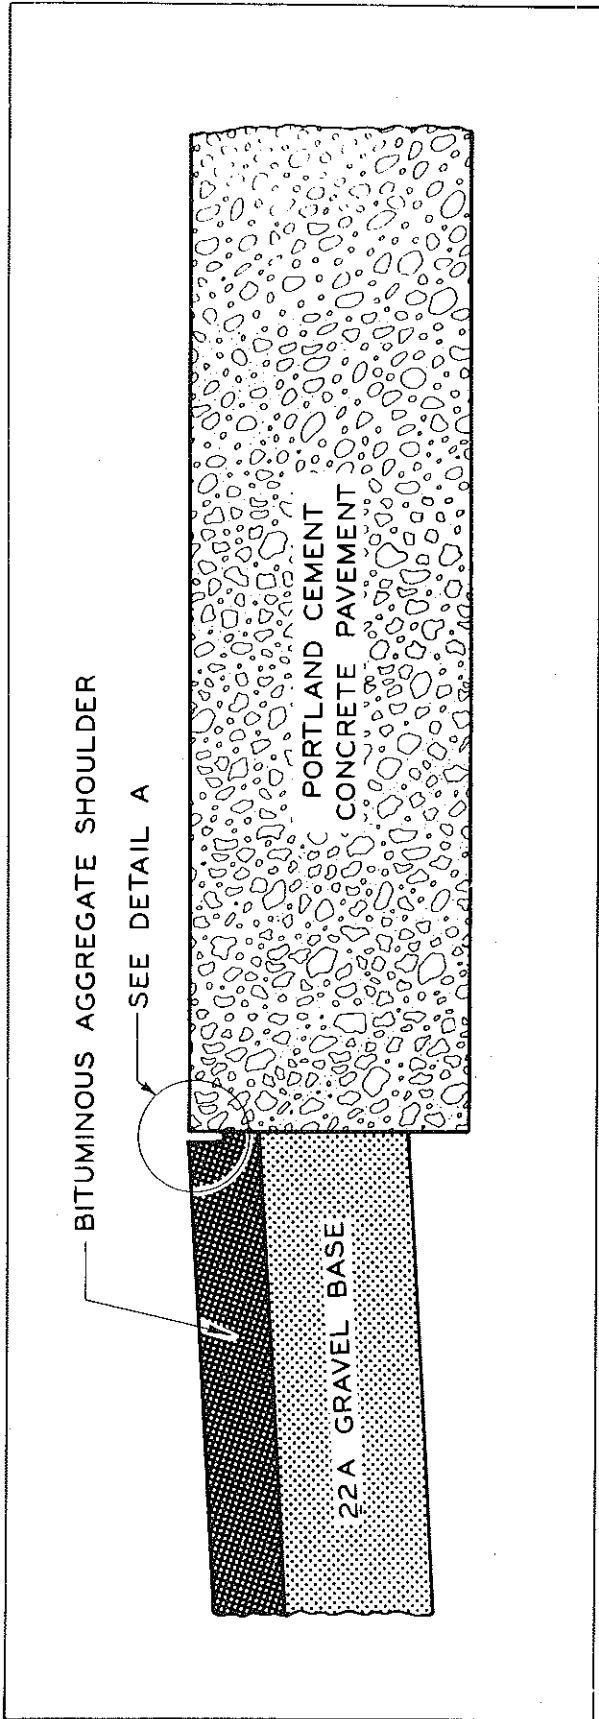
Sealed joint between bituminous aggregate shoulder and portland cement concrete pavement.
